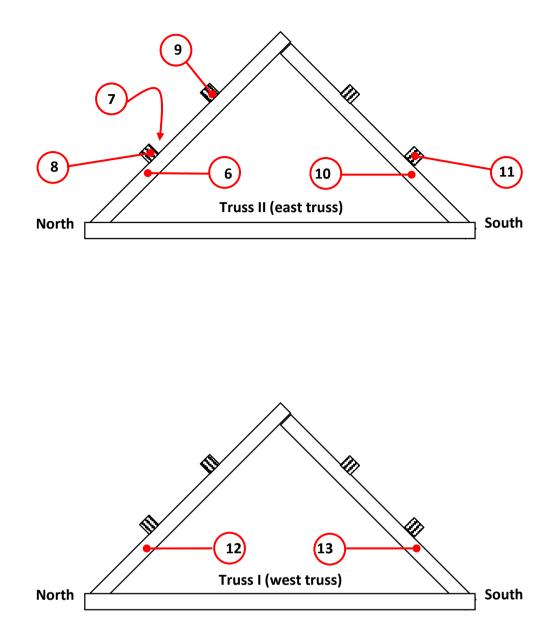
Sections through the roof trusses of building 1 to locate sampled timbers (see Table 1)
